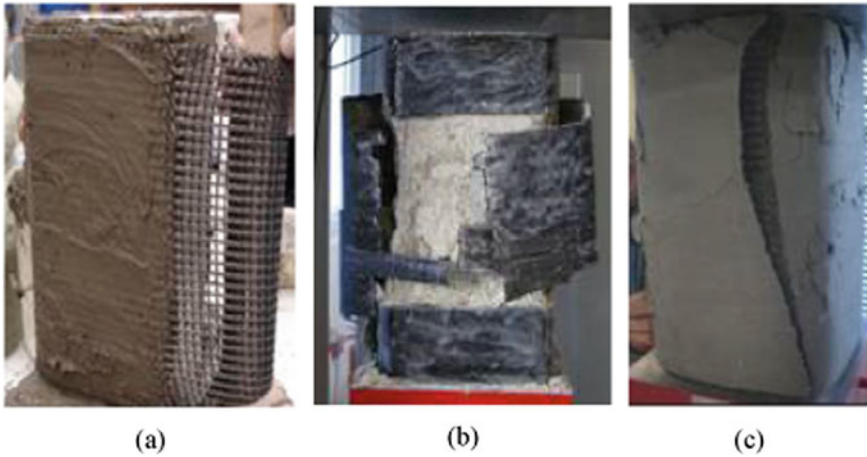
Failure of columns under compression. a Strengthening procedure and failure; b textile rupture and c debonding (Picture Courtesy Bournas et al. 2007)
